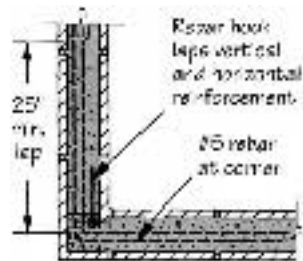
Unreinforced masonry walls did not fare well in the storm — many collapsed. Fully-grouted tie columns should be located at every building corner and at least every 20 feet along walls. Rebar splices in tie columns and bond beams should lap by at least 25 inches.
